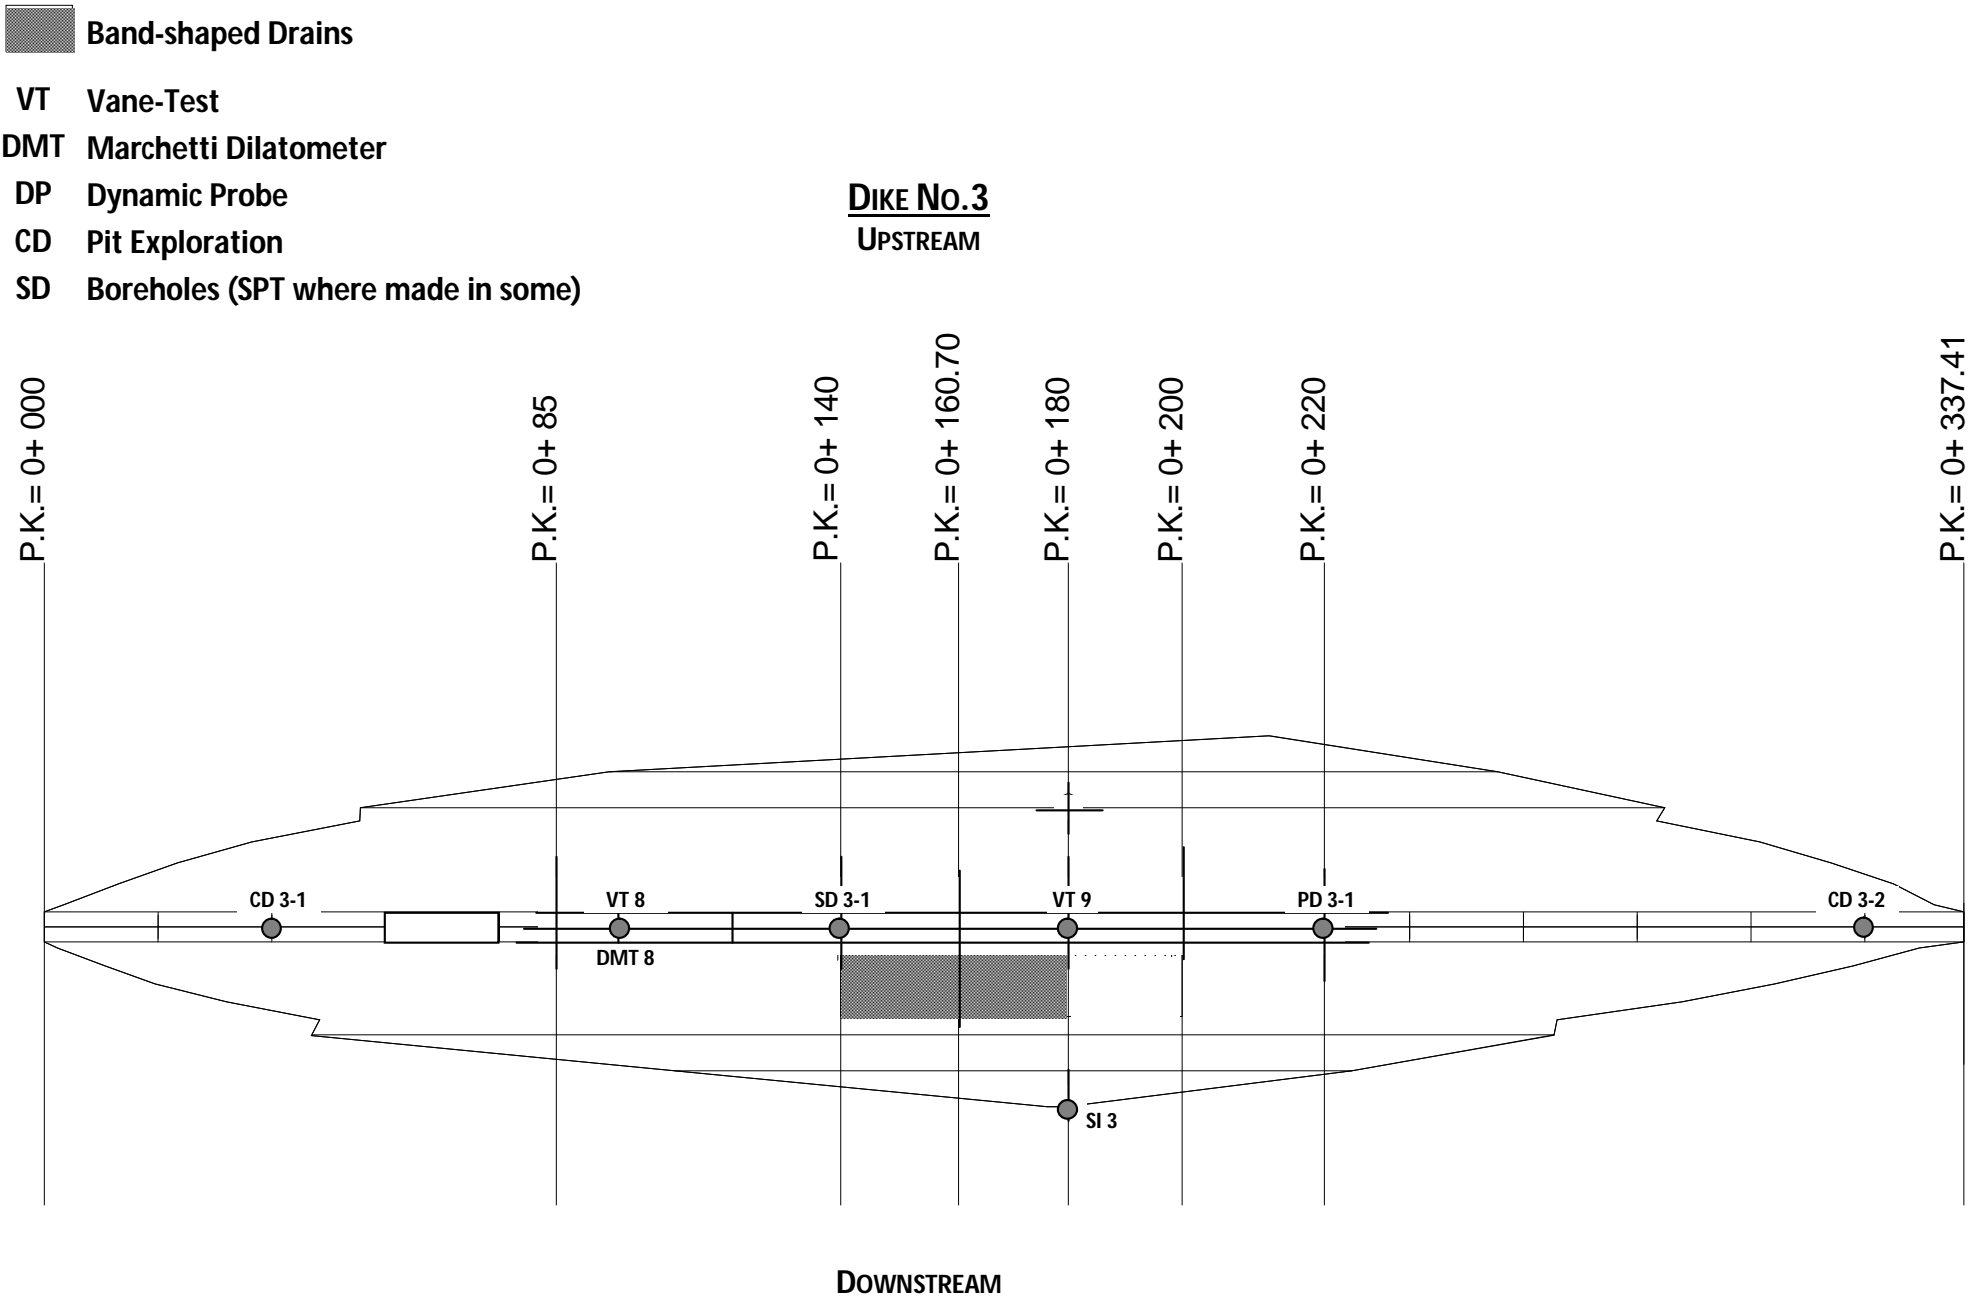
Plan showing the geotechnical site investigation made in Dike No.3.
